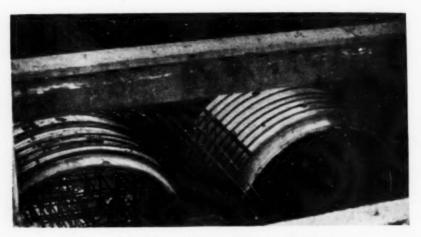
Reinforcement around Precast Pipe Culverts.
